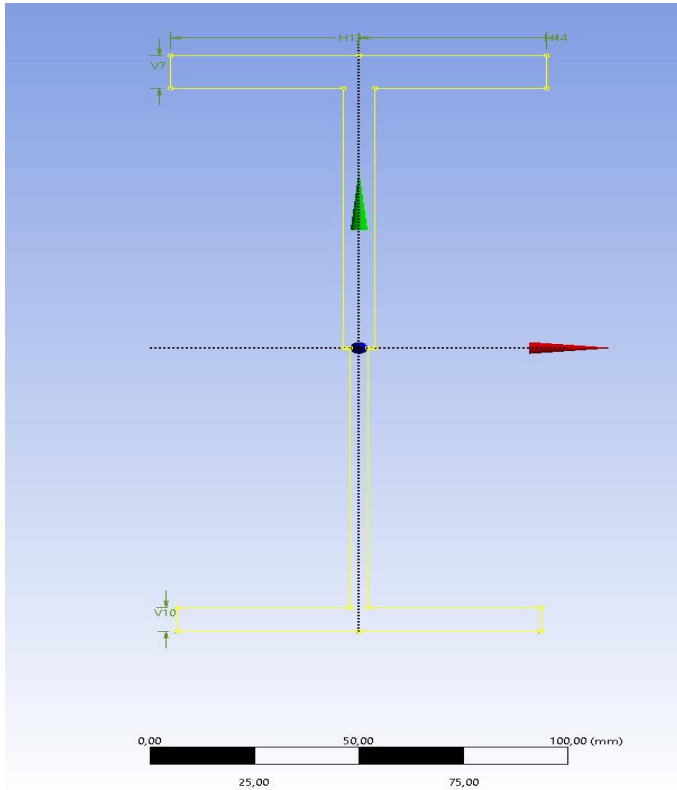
2D View – Geometry -Modelling Part
